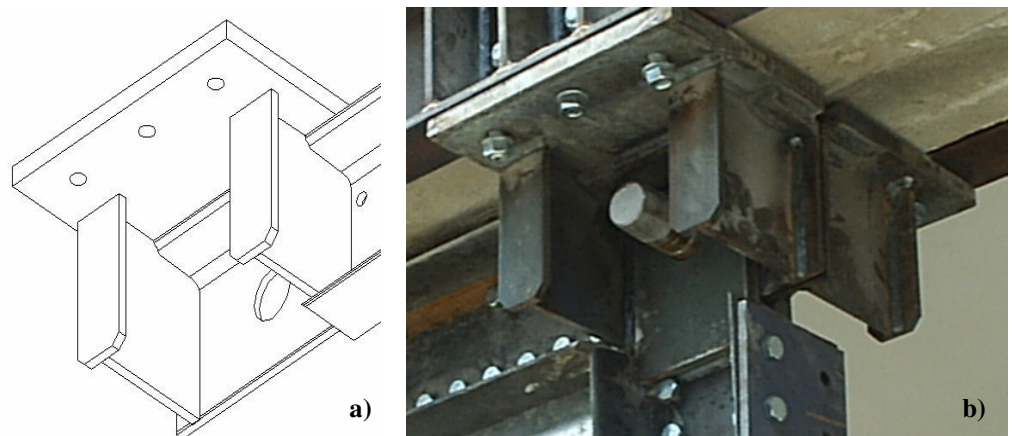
Beam-to-column hinged connection: 3D view (a) and the realised detail (b)
